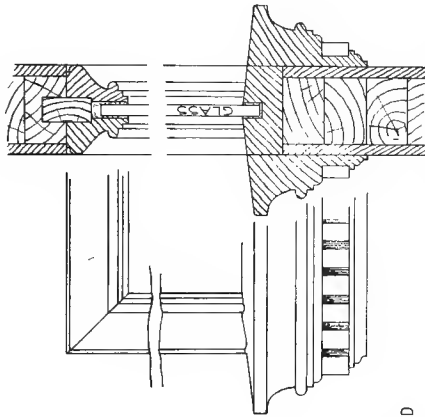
DETAILS OF INTERIOR DOOR FRAMES AND WOODEN SILLS.
